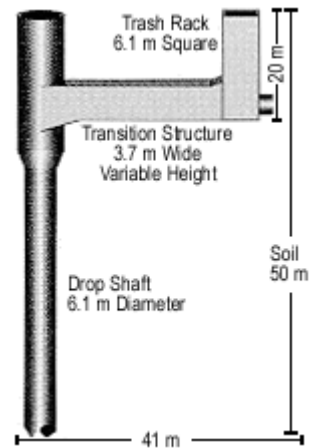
Proposed underground structures (from Contact Documents, 1983).
